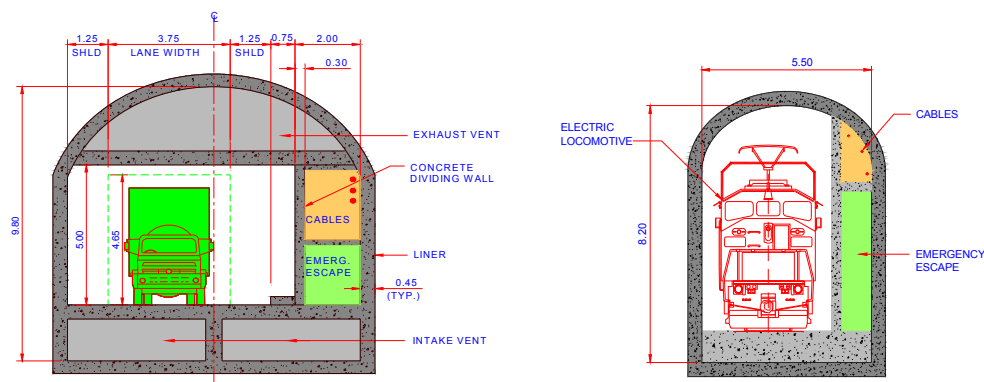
Drill & Blast Tunnel Concept for Road and Rail (2004 Pre-Feasibility Study)
